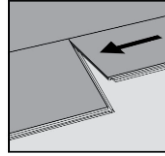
Starting the Second row First plank should be a min length of 300-500 mm. Put a 12- 15mm spacer against the wall and measure the last piece. If it is shorter than 500mm a new starter piece should be used. Drop or insert the plank at an angle into the previous row and tap (on the long side) it in using a tapping block till flat.
